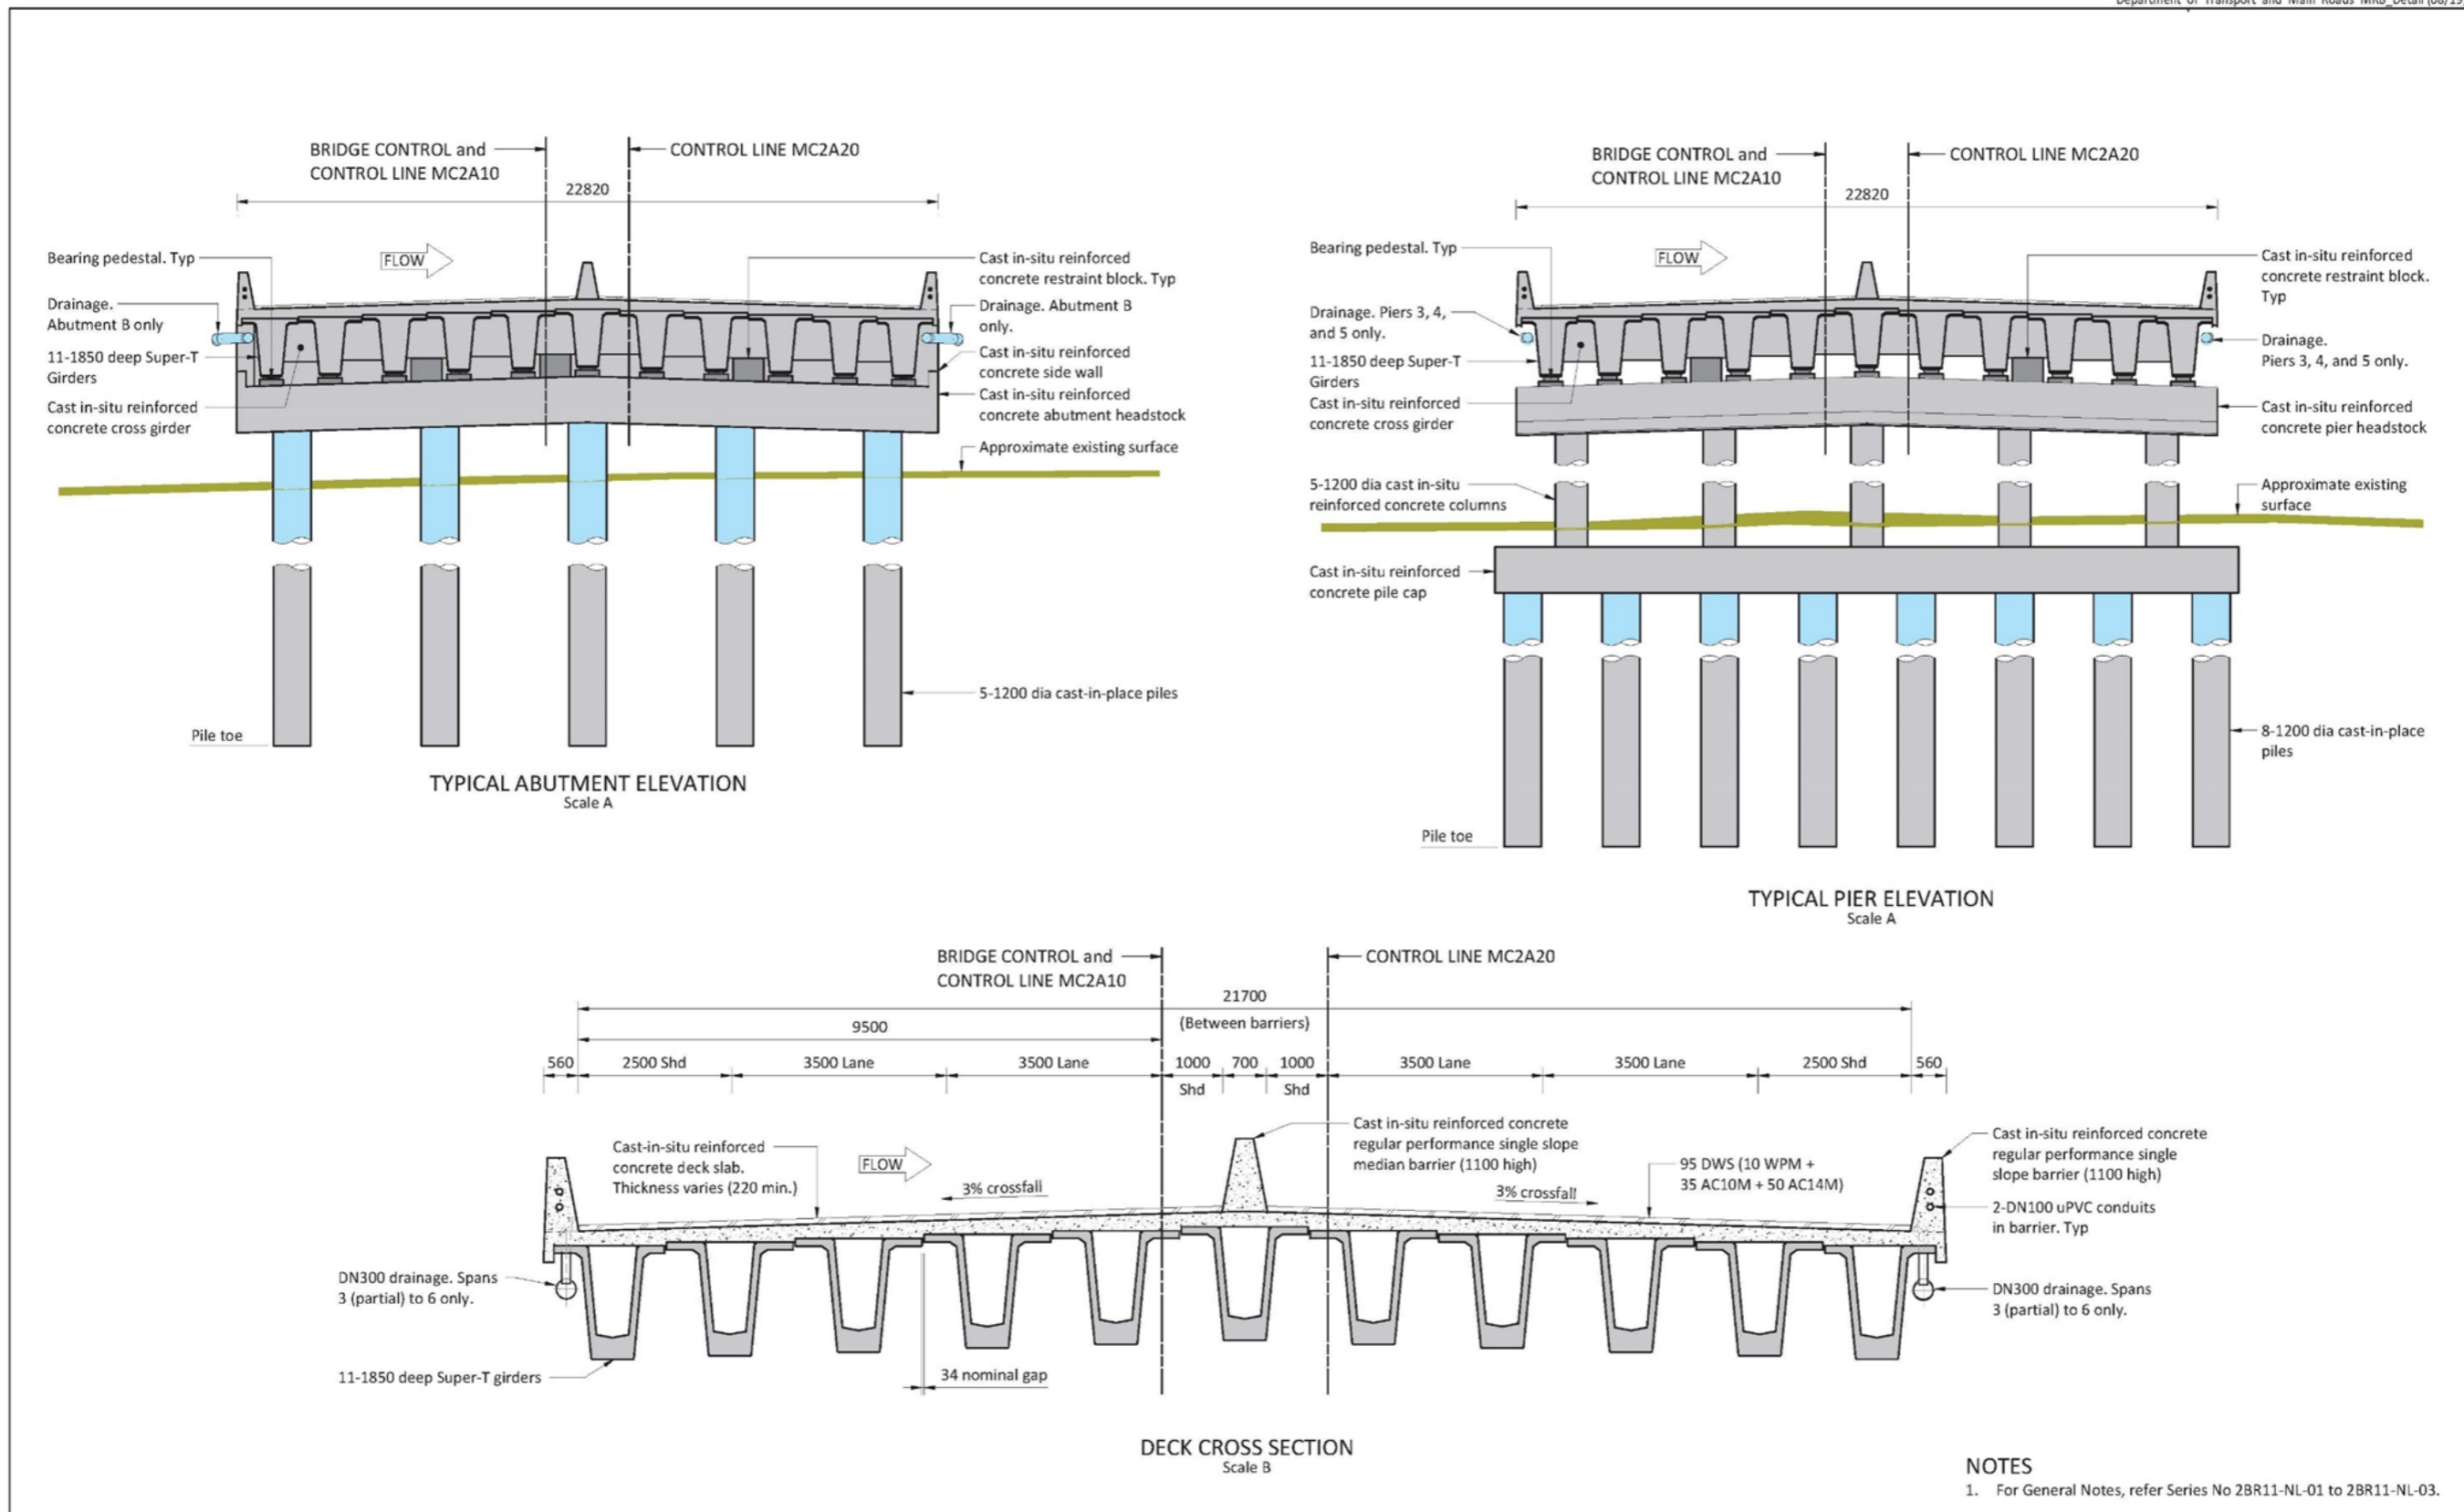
(f) - Example General Arrangement drawing 3 of 5 for Super-T girder bridge
